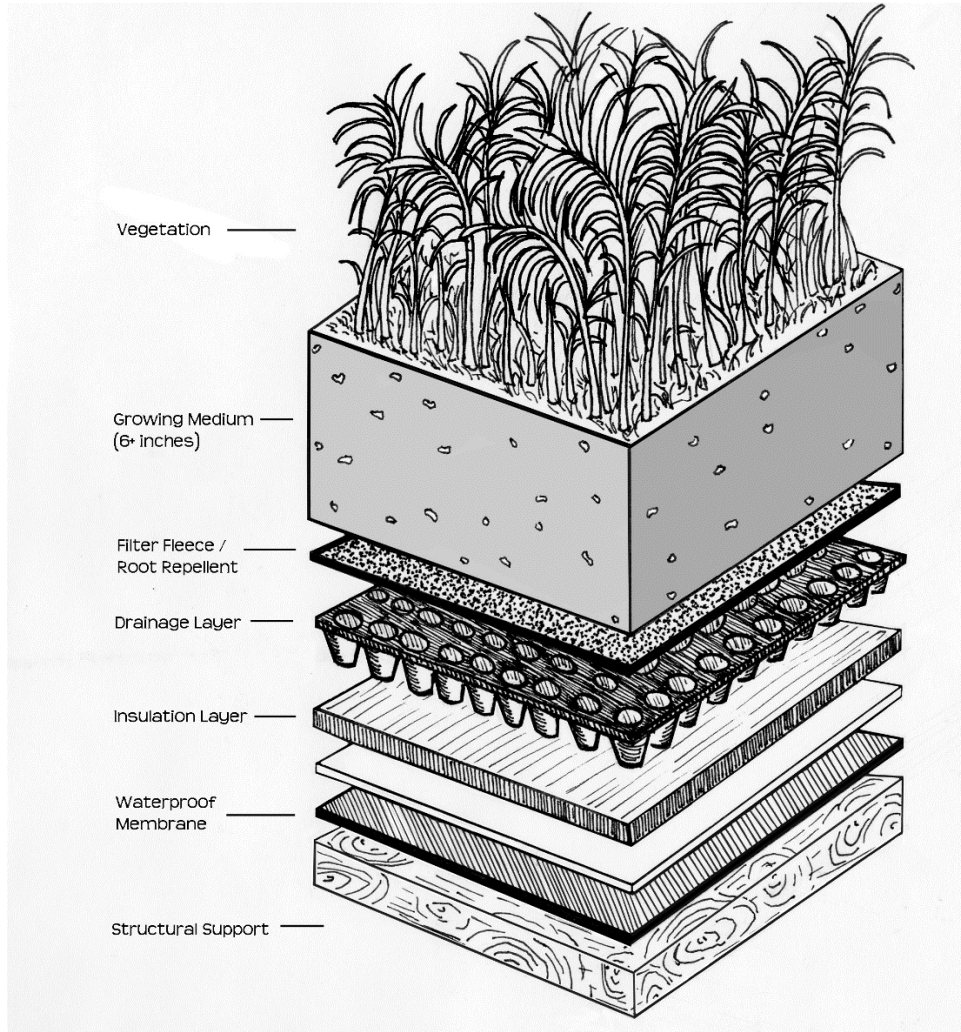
Example of an Extensive Green Roof Design. – Source: Greenroofplan.com
